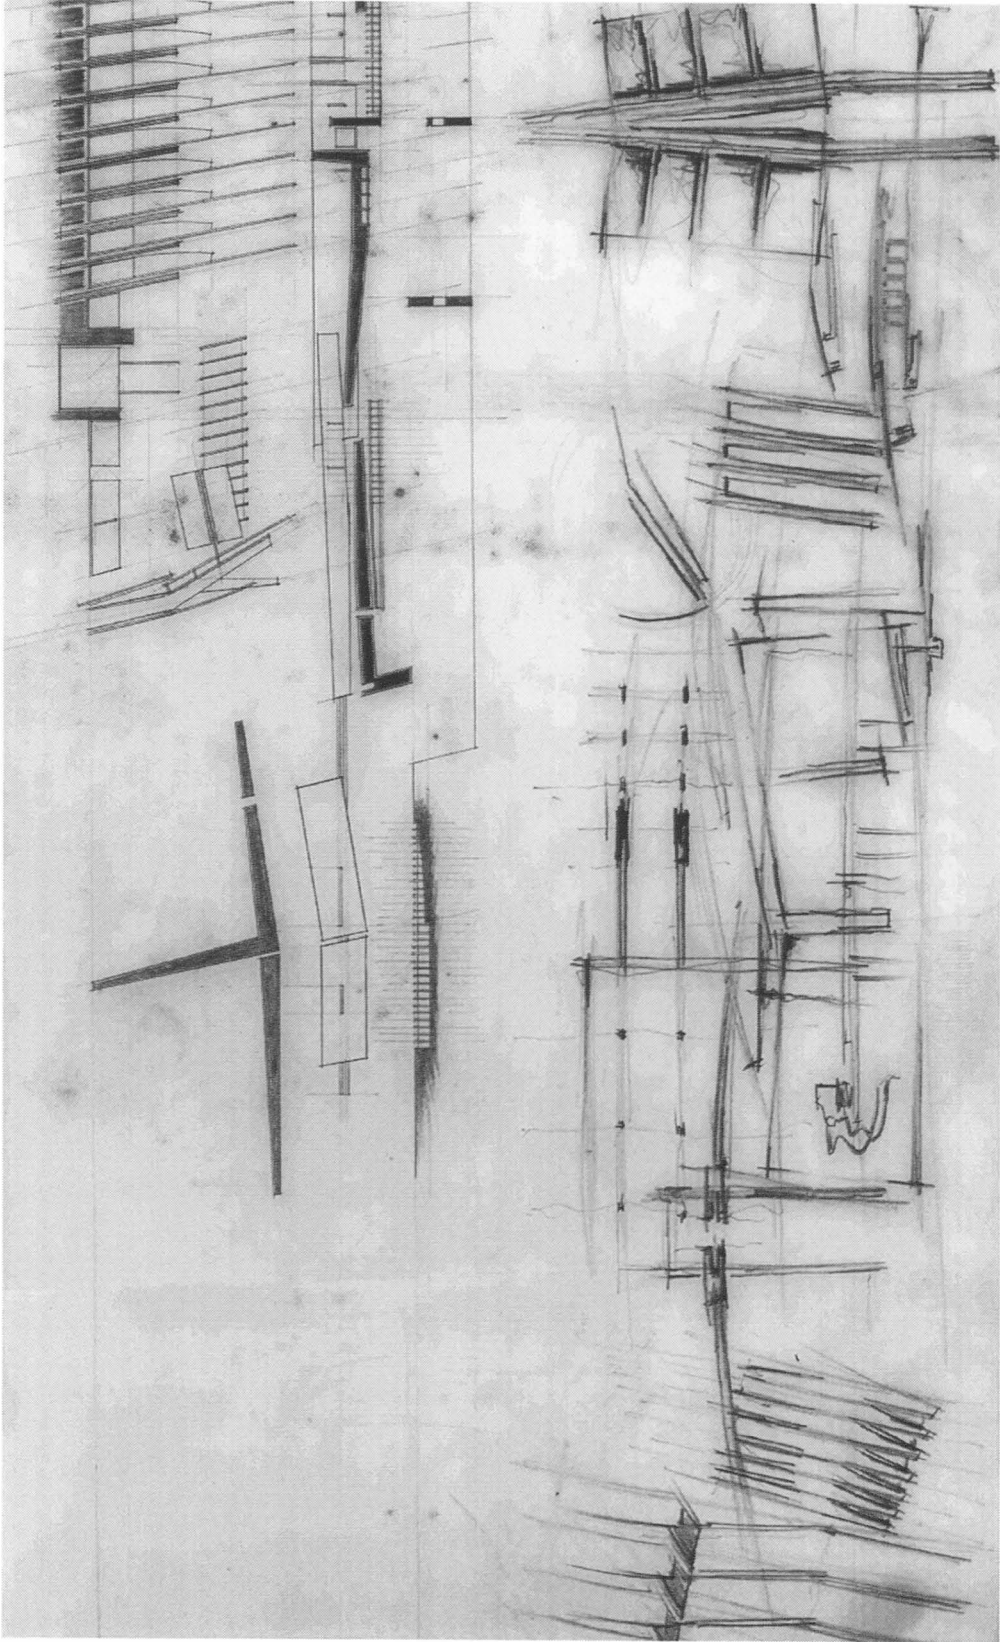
Plan Study with Sketches of Chamber Located Down the State Street Mall
